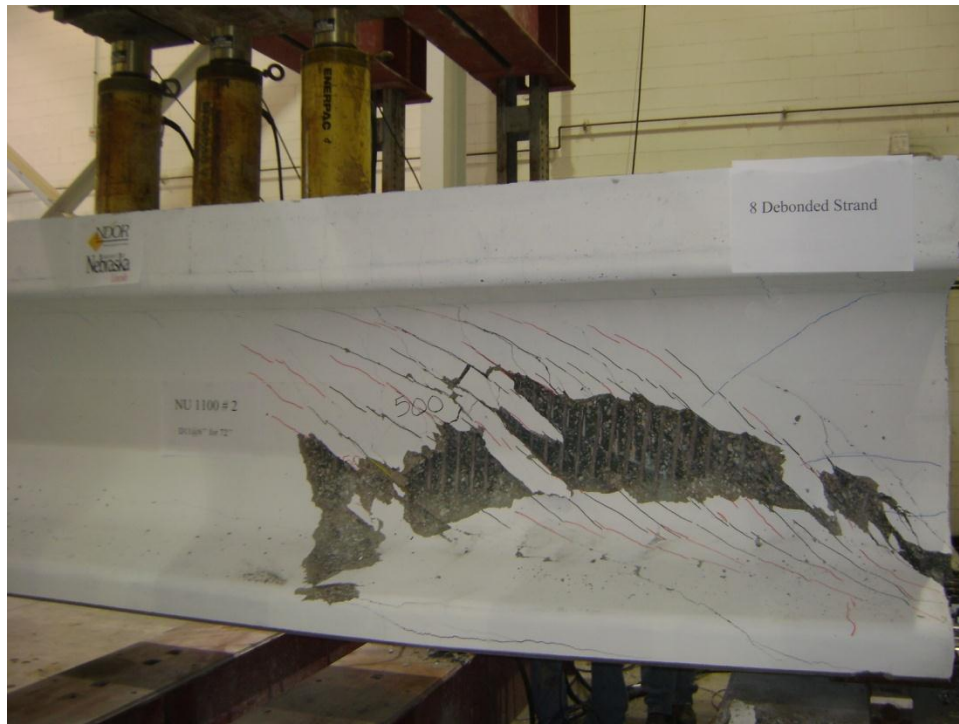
Shear failure of NU1100 Girder 2
